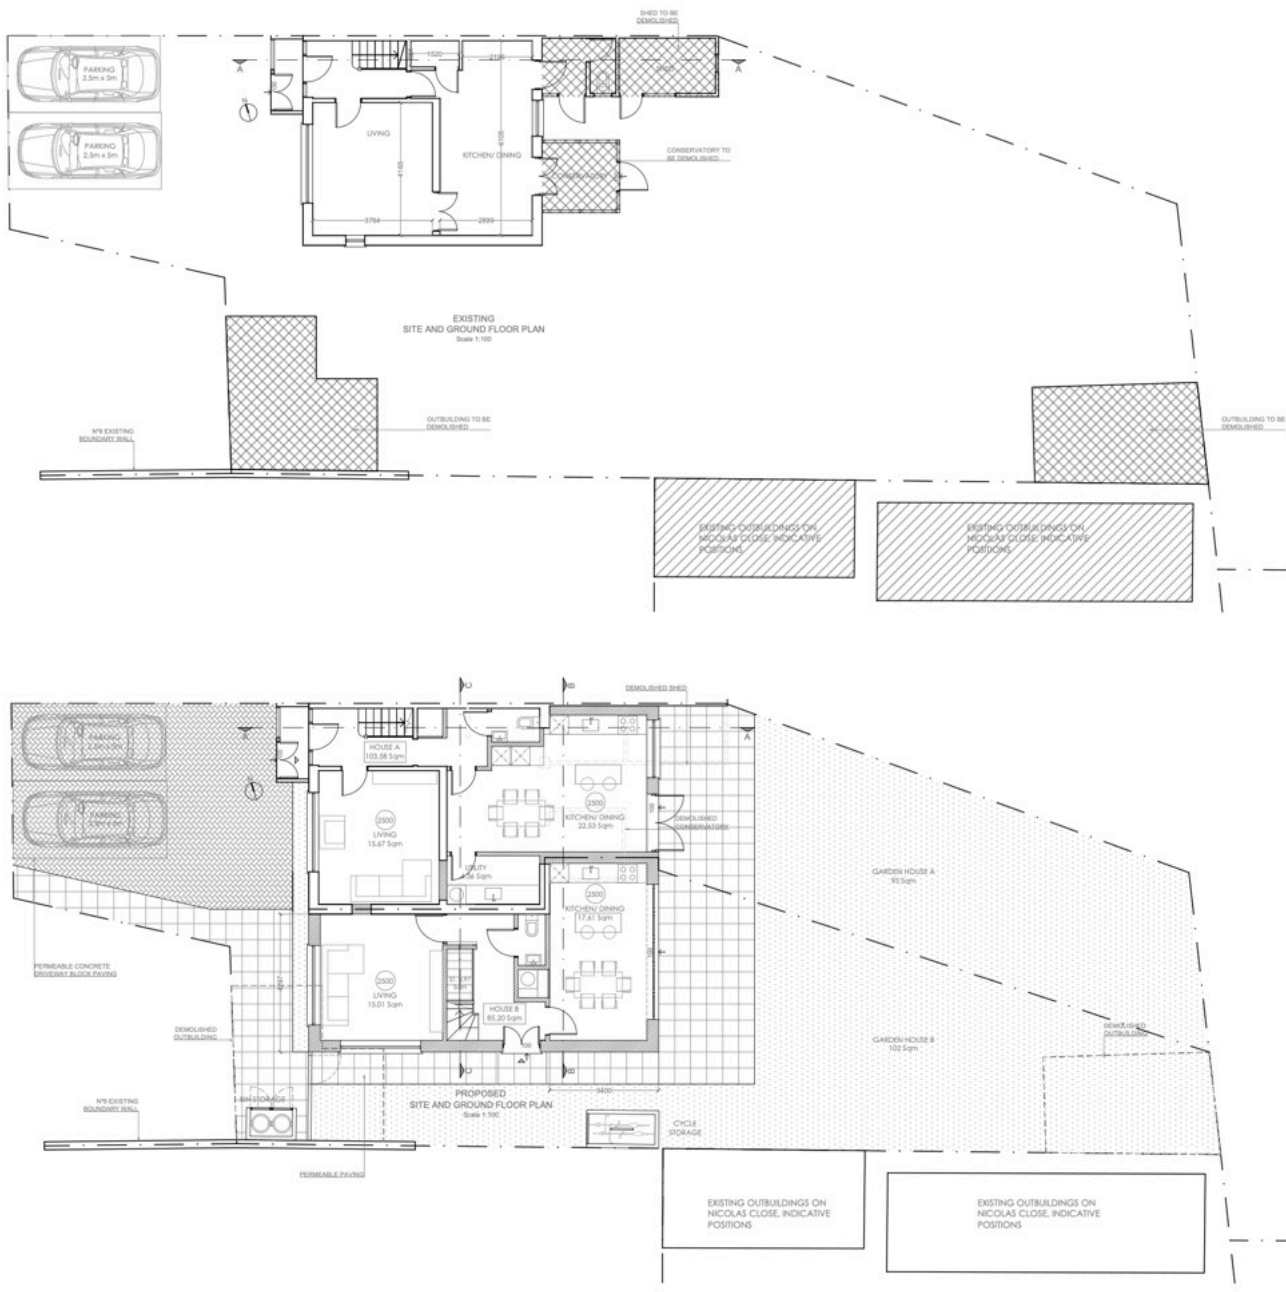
EXISTING AND PROPOSED SITE PLAN
